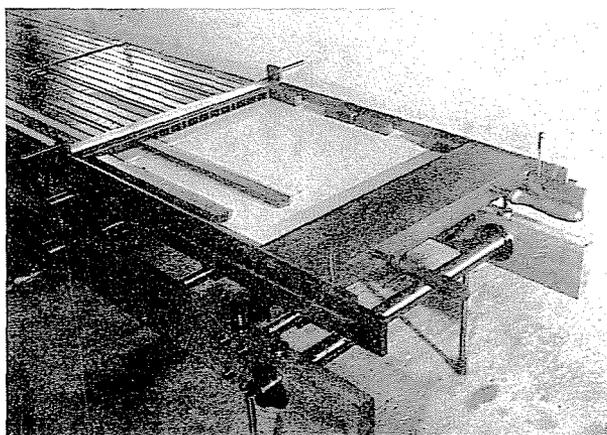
The wall apparatus is composed exactly as the floor apparatus. Wall elements contain, however, a closed channel system. In case of wall elements only the longitudinal keys are used, in case of beam elements — as shown by photo — the cross-keys are used, too. This apparatus is *convertible*. The six different sizes and forms required have simply been realized through a combination of keys and proper adjusting of the butt end.
